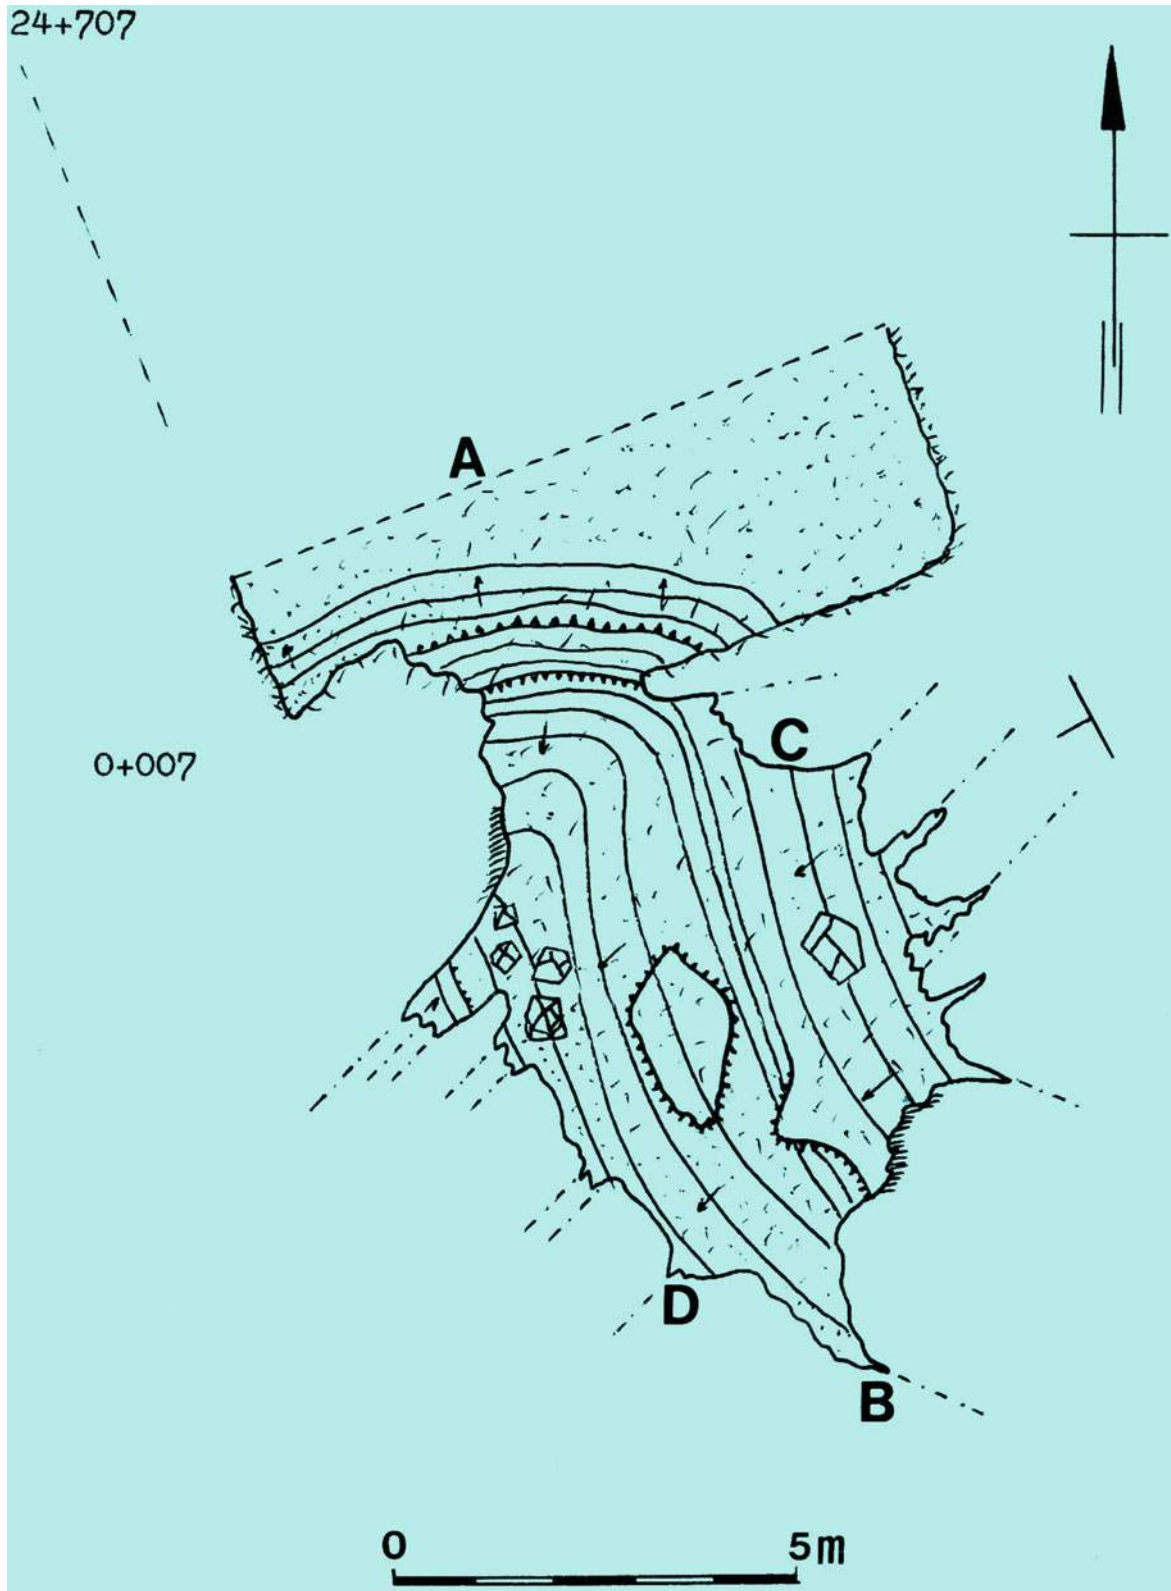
Plan of cavern at km 24 + 707 in Tuhobić Tunnel
